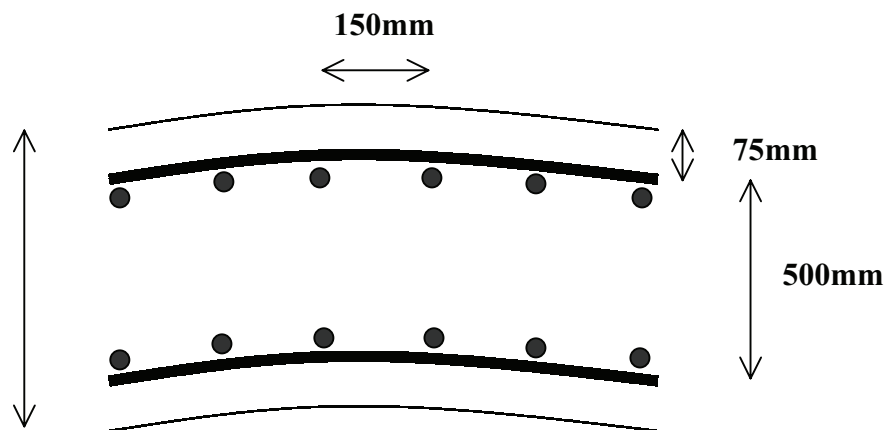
Sectional plan view – Vertical Reinforcement
